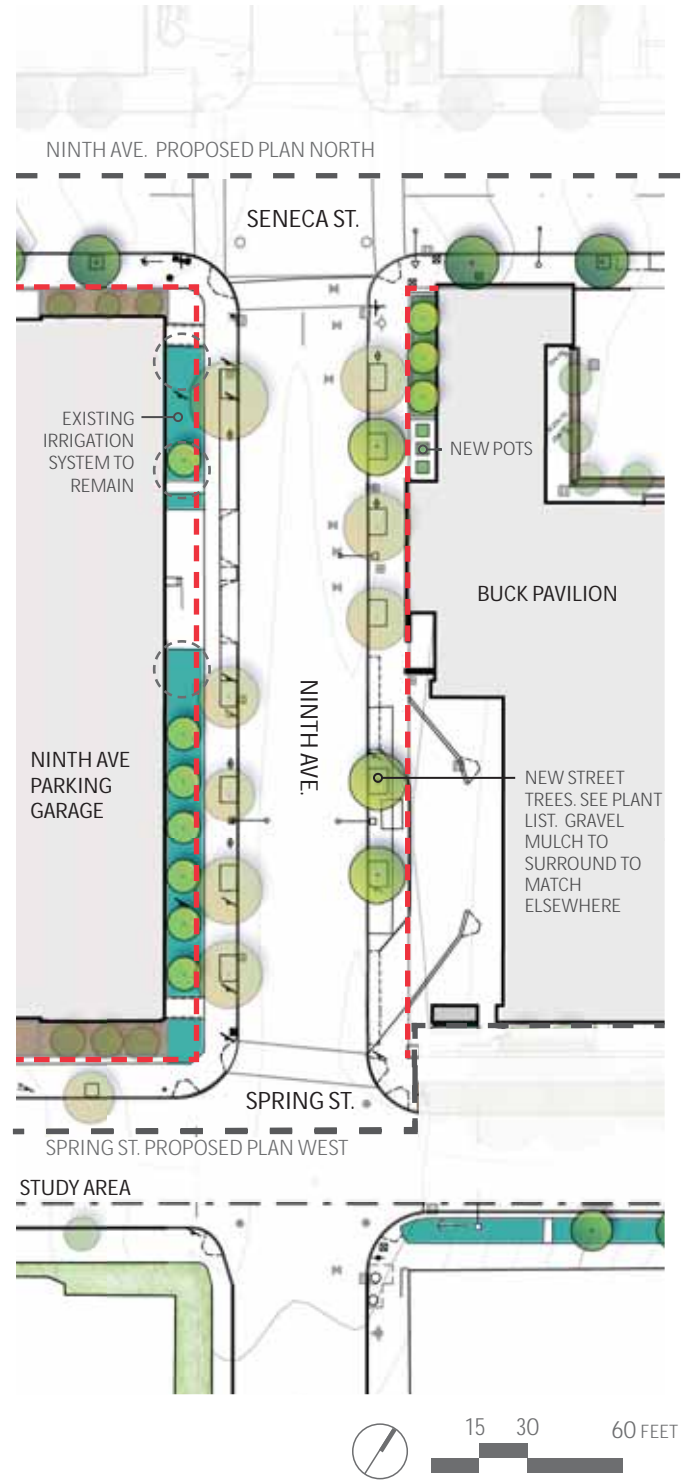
NINTH AVENUE PROPOSED PLAN SOUTH
